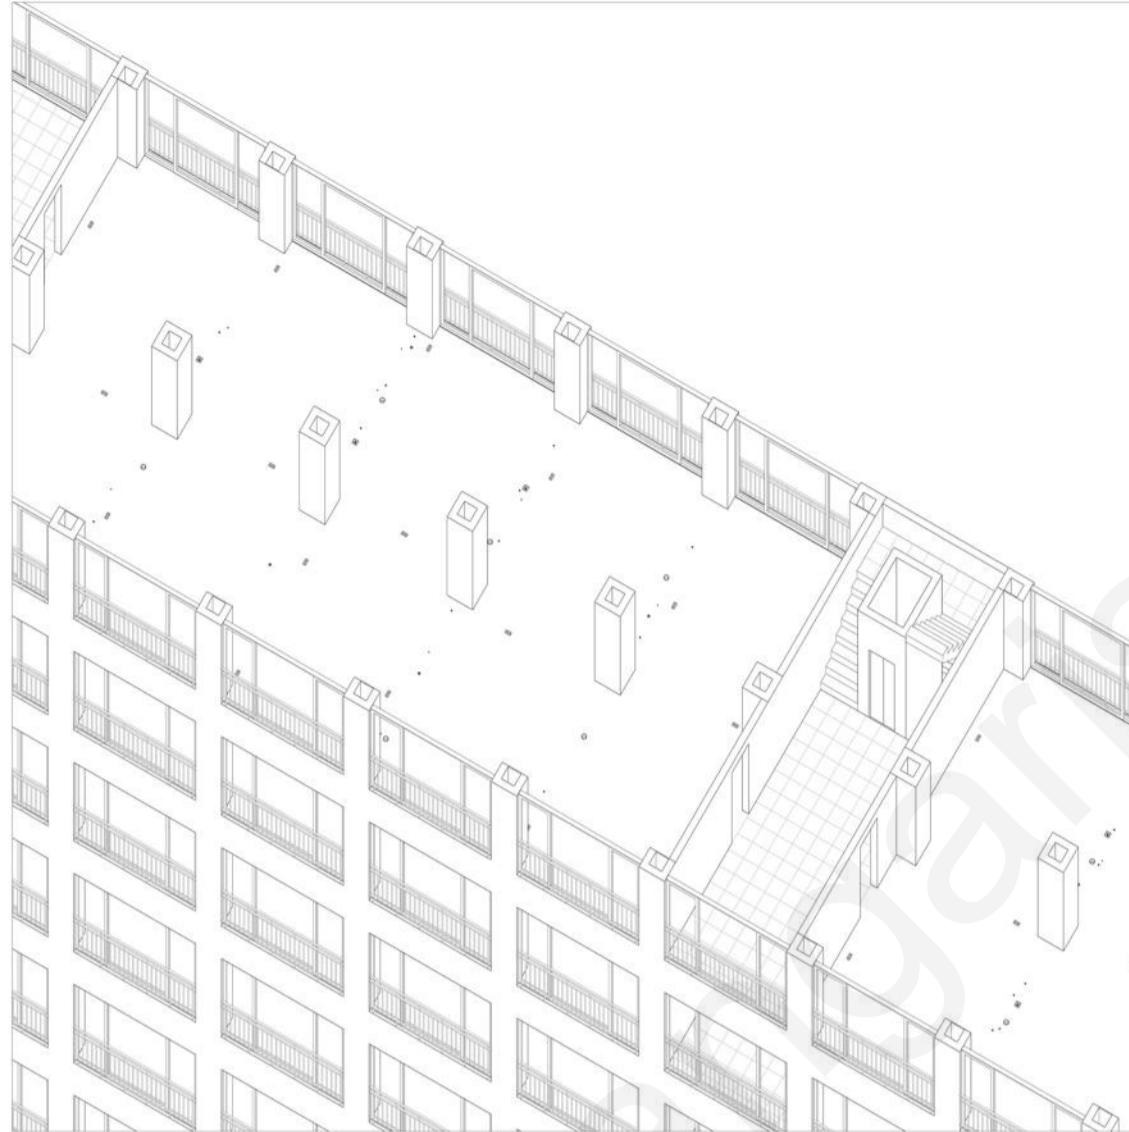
Living Room - Isometric Plan Indicating the Position of the Utilities.
